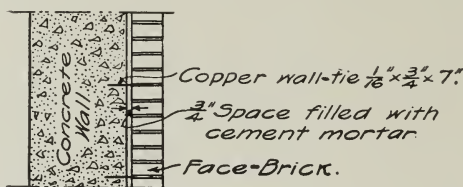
Brick Facing for Concrete Wall. Ketterlinus Building, Philadelphia, Pa.
